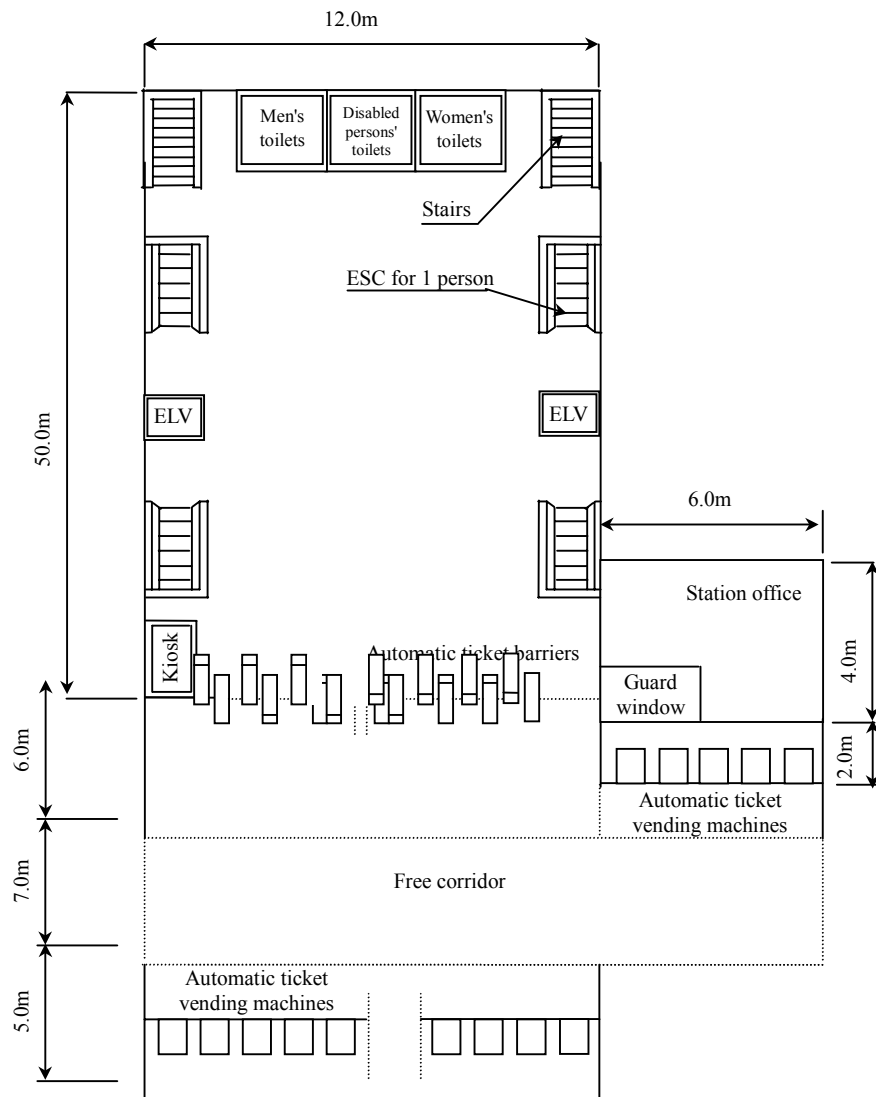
Preliminary Plan of Magallanes Station Facilities
